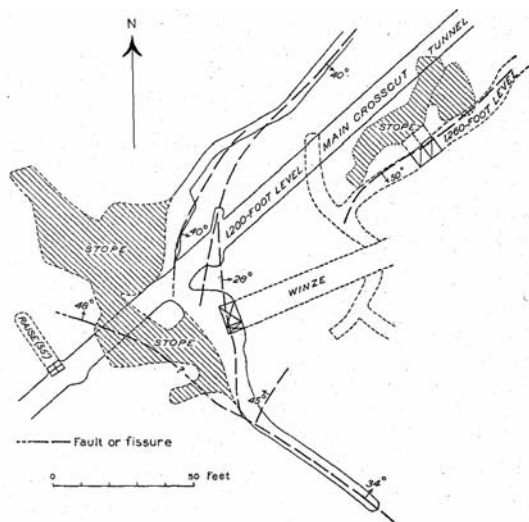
Plan of developments on the Clark vein, Rawley drainage tunnel.
